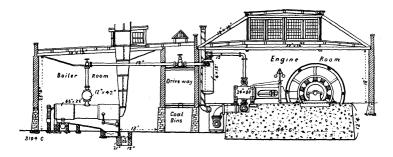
Cross Section through Cass Avenue Power House, St. Louis.
